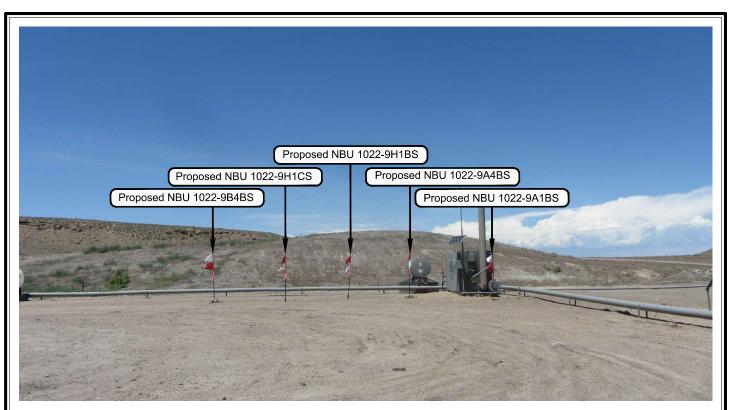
PHOTO VIEW: FROM LOCATION STAKES TO PIT CORNER D
